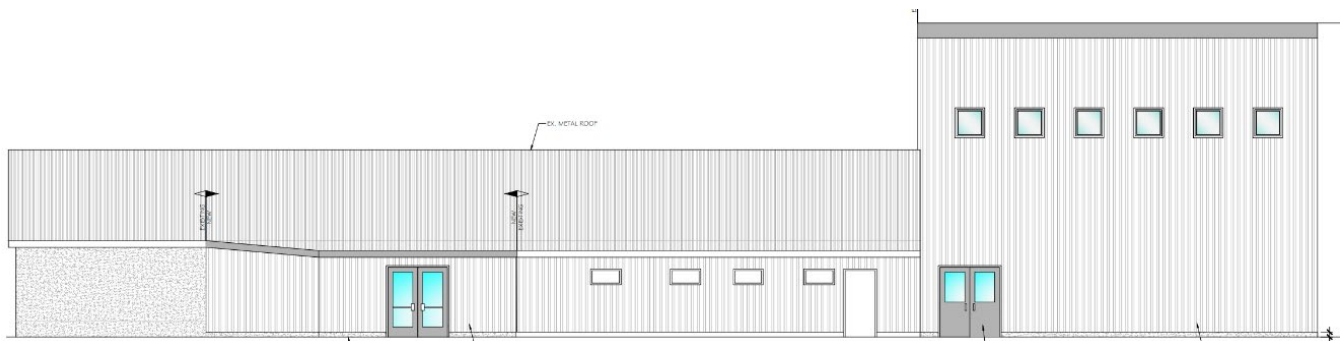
Southwest Building Elevation (Source: Eastern Engineering)
